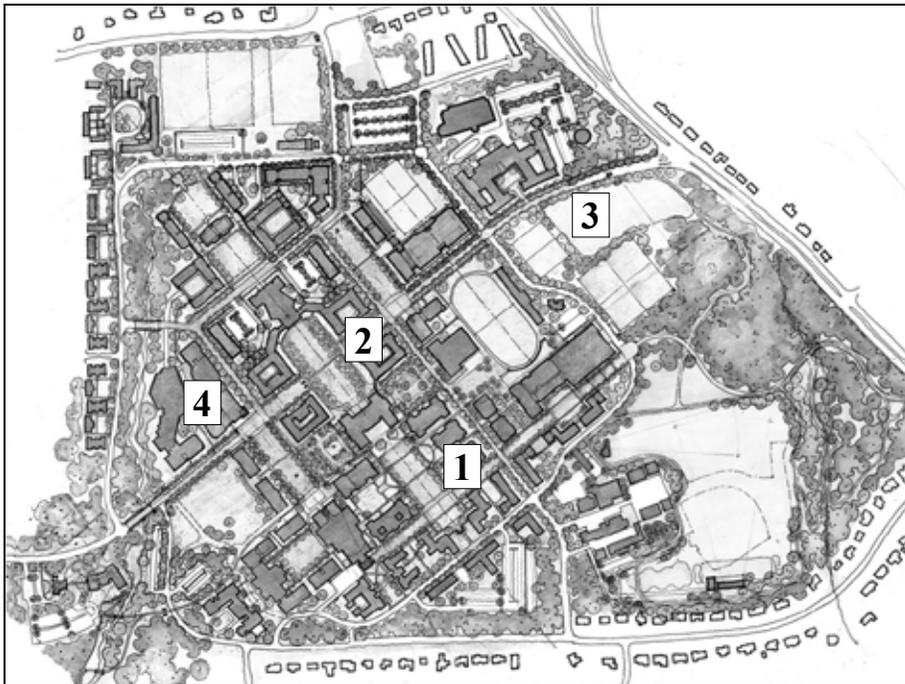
Locations of streetscaping and stormwater management opportunities along Wingate Road and Wake Forest Road under the master plan.
